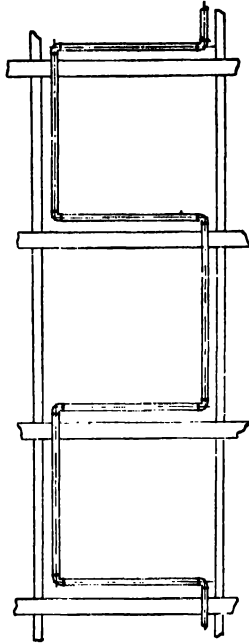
Piping from tank or cylinder concealed in linen cupboard and arranged to occupy little space: tank on wood bearer, and having manhole facing door.
